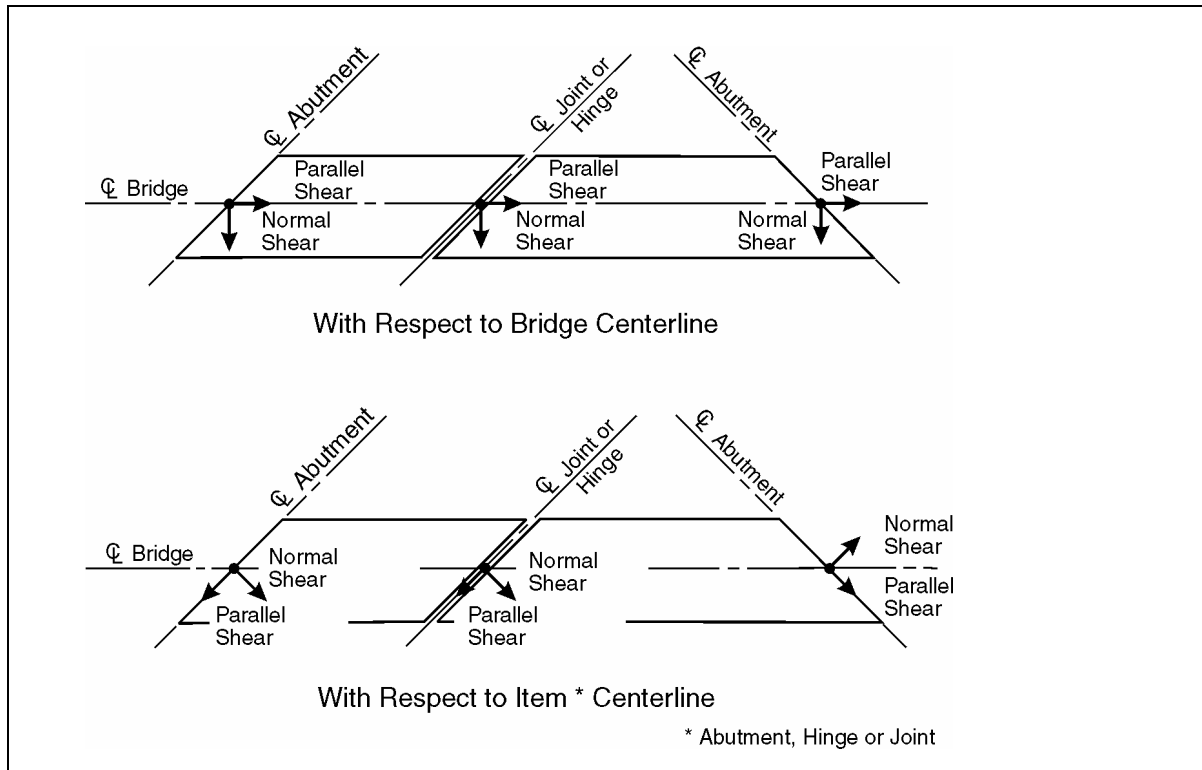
Positive sign convention for abutment, hinge and joint forces.
